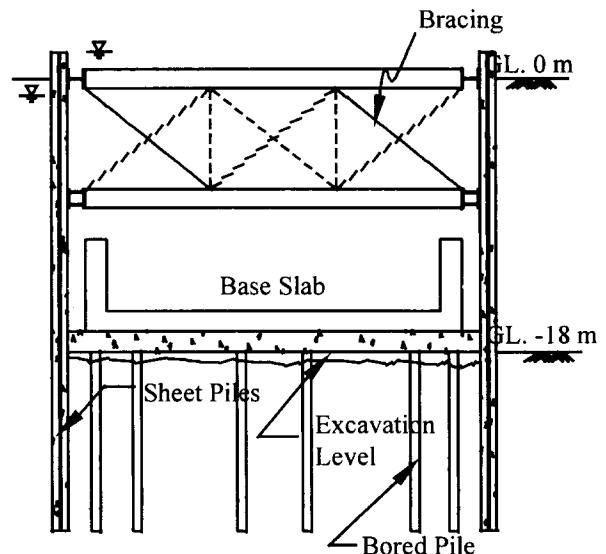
Wet Excavation at Marina Bay in Contract 310 of SMRT (Modified from Denman et. al., 1987)
